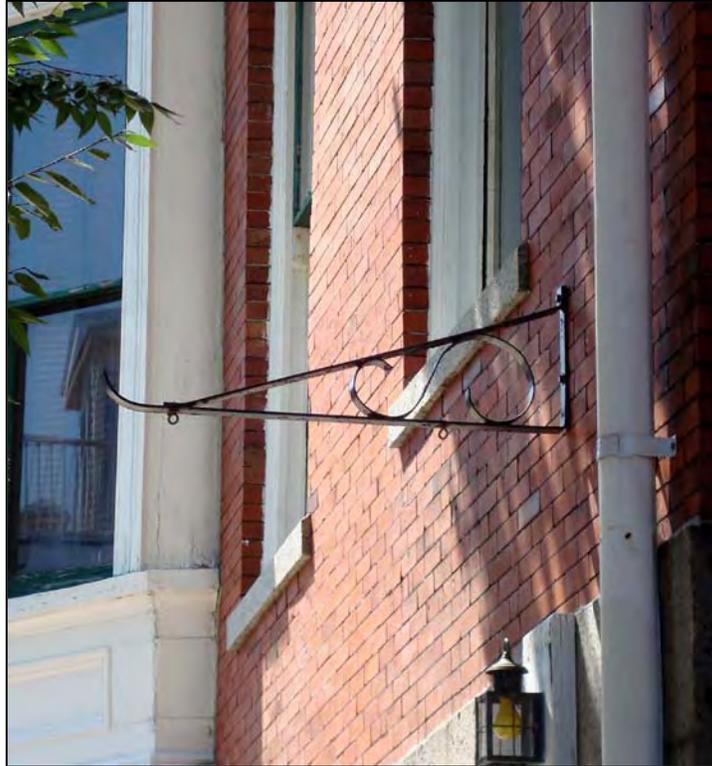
Representative first-story window (W117) in the north elevation of the Double Bank Building (2008).
